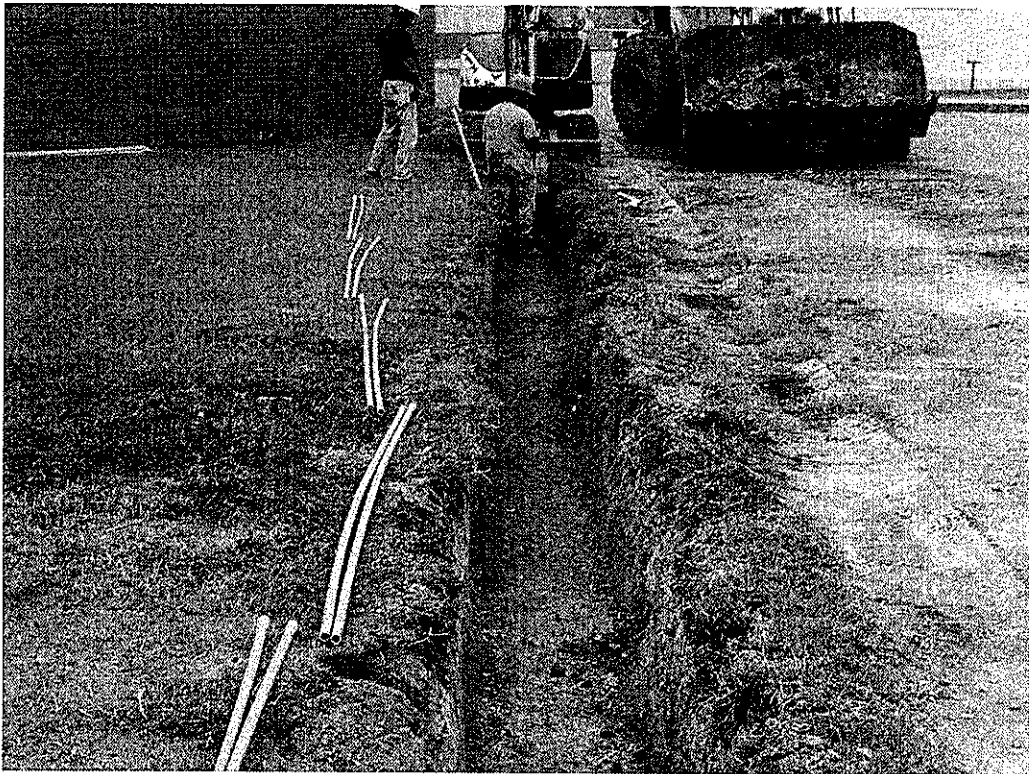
Phase II – Excavation and marker layer for Electrical Conduit Installation.
